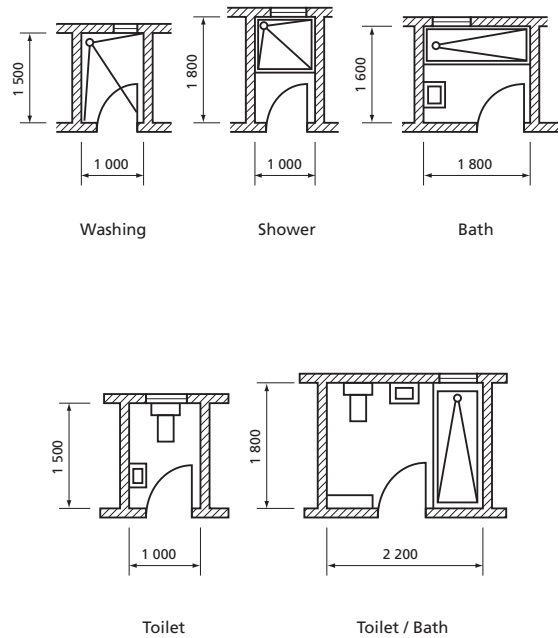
Recommended space for indoor toilet and bathing facilities
